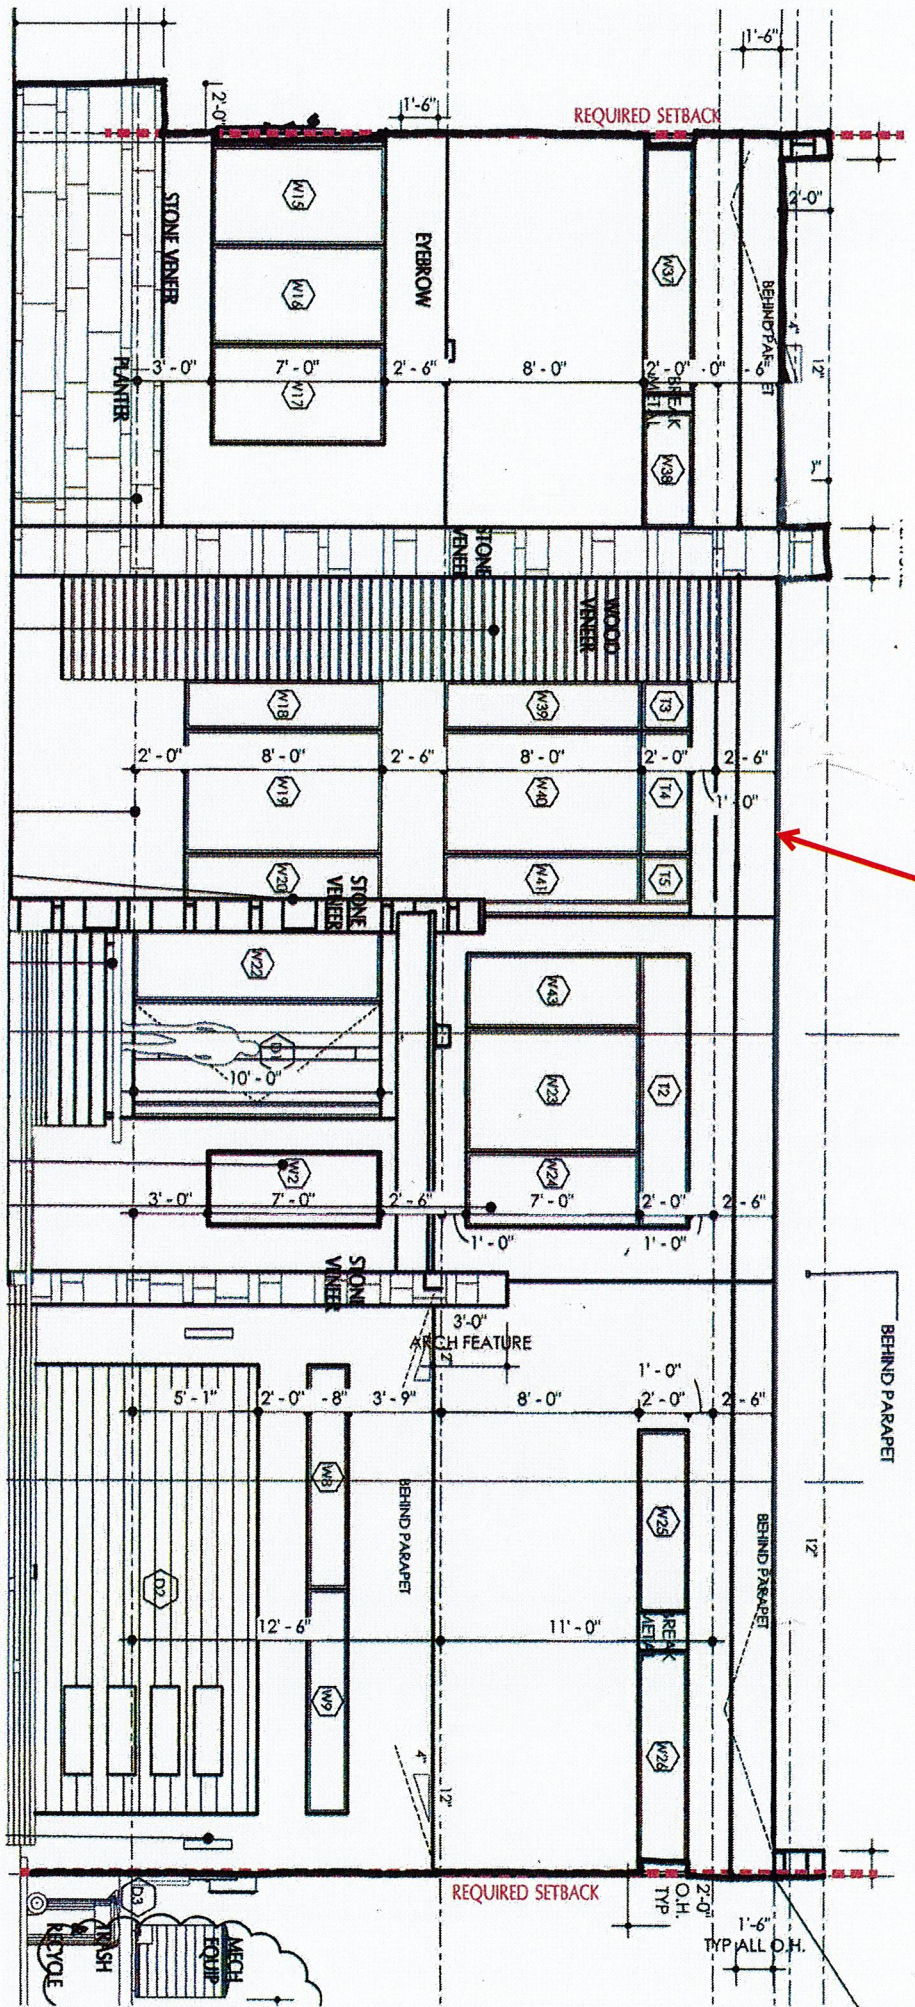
" - ELEVATION WITHOUT 4/12 ROOF BEHIND PARAPET
